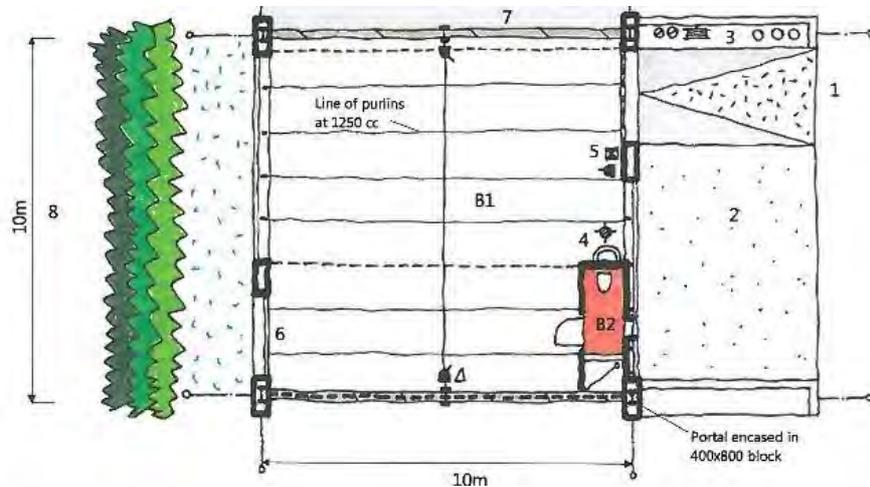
Typical plan of a workshop space. (John Royal Architects)
